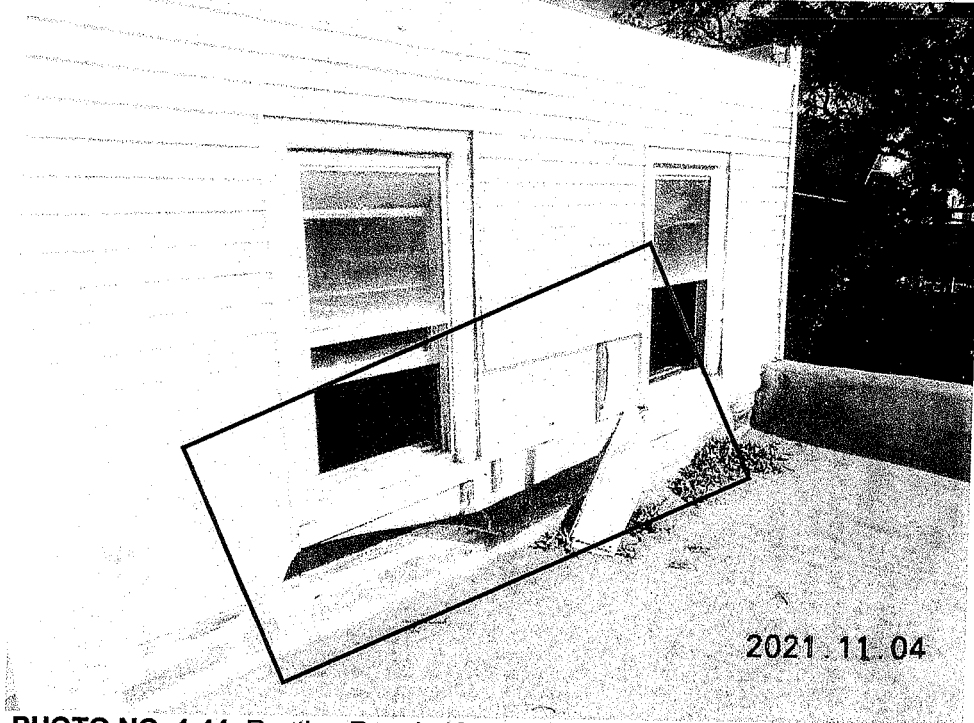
Routine Repair 19 – Partially detached and missing vinyl siding – South Elevation, Grid 1-2: Ht. 20'+/-
